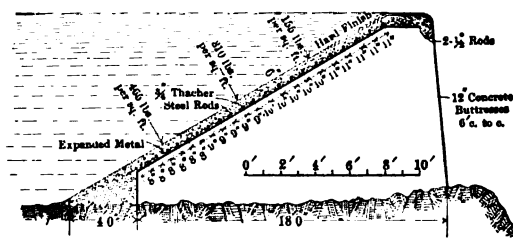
Cross-section of Reinforced Concrete Weir, Theresa, N. Y.
